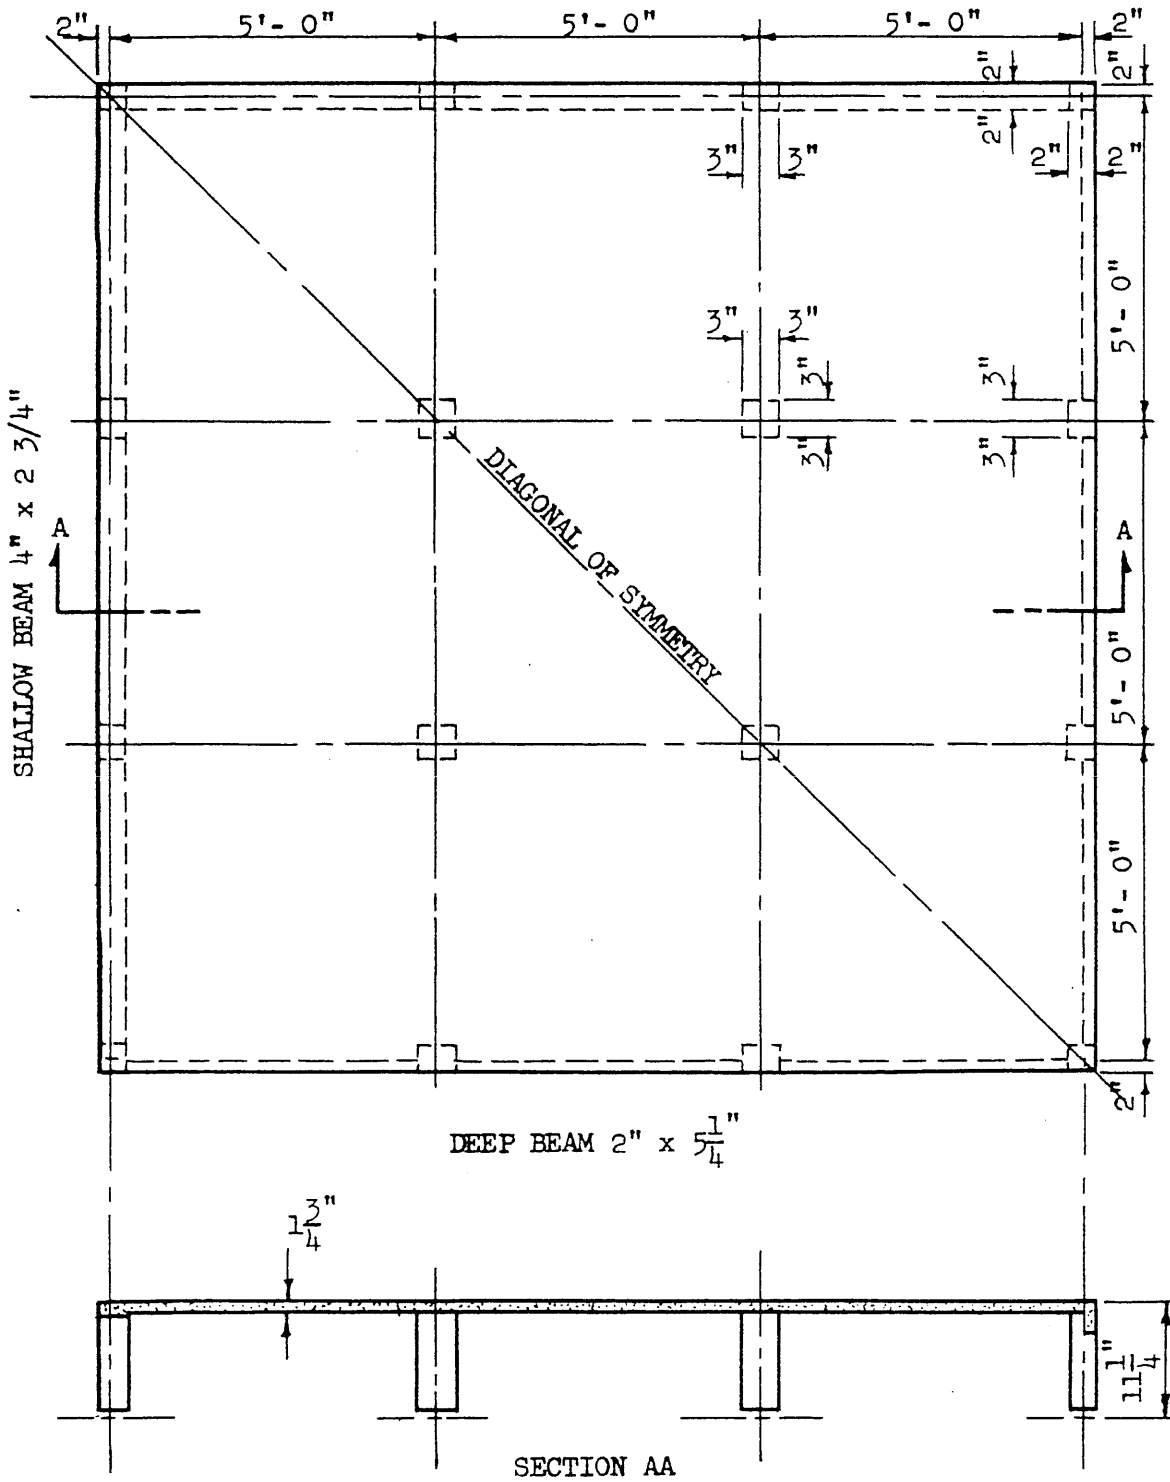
LAYOUT OF NINE-PANEL REINFORCED CONCRETE FLAT PLATE
